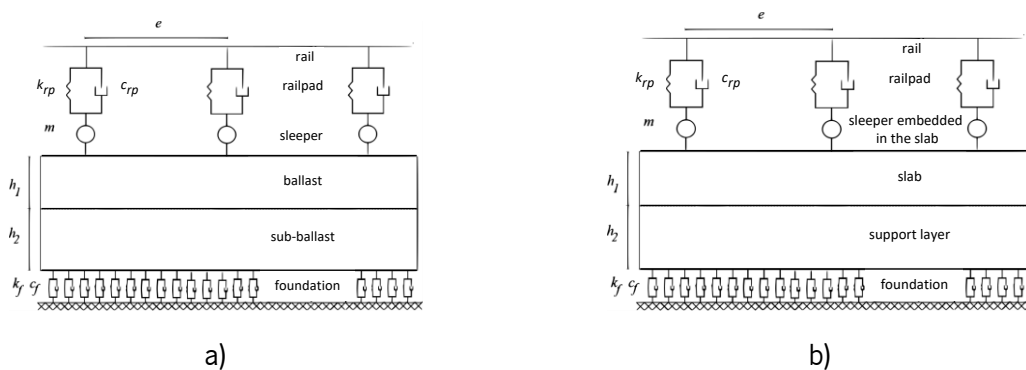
a) Continuous models in longitudinal direction considering plane stress state elements (ballasted track); b) Continuous models in longitudinal direction considering plane stress state elements (ballastless track) – adapted from Vale (2010)
